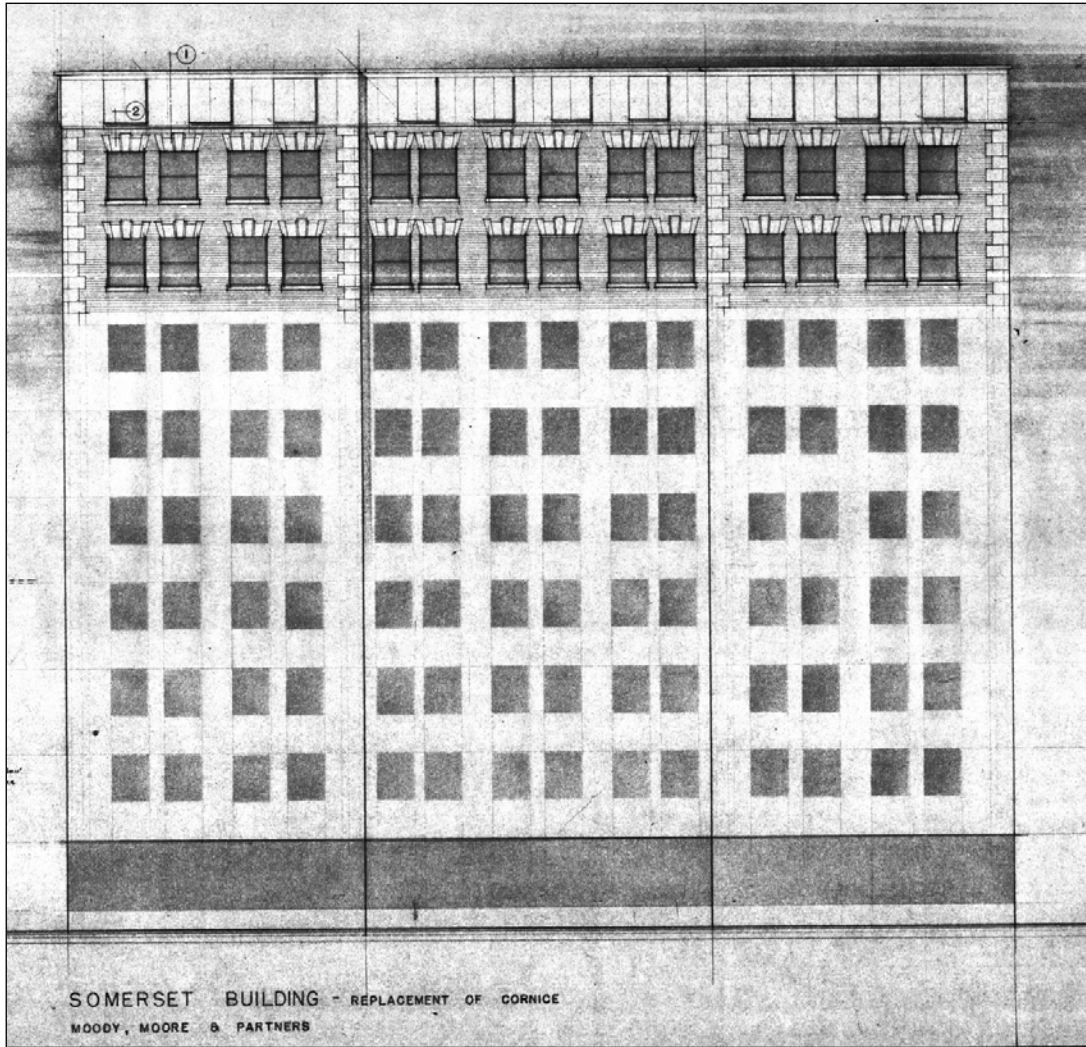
Somerset Building, Portage Avenue, Architect’s Plans, “Replacement of Cornice,” 1962. (Courtesy of City of Winnipeg, Plan #5530/1962.)
